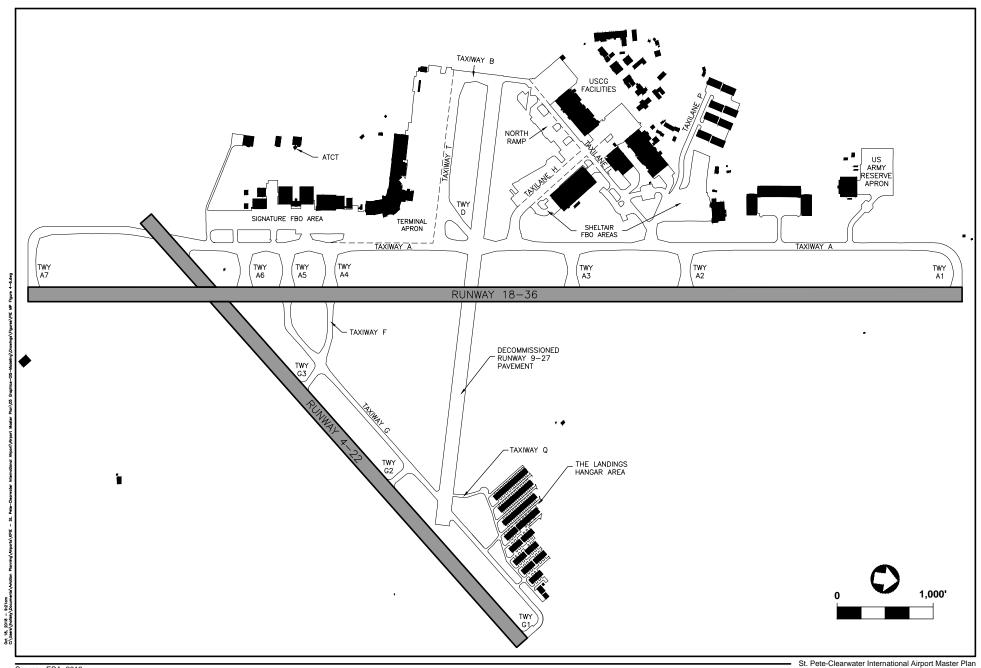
EXISTING AIRFIELD PAVEMENT AREAS
